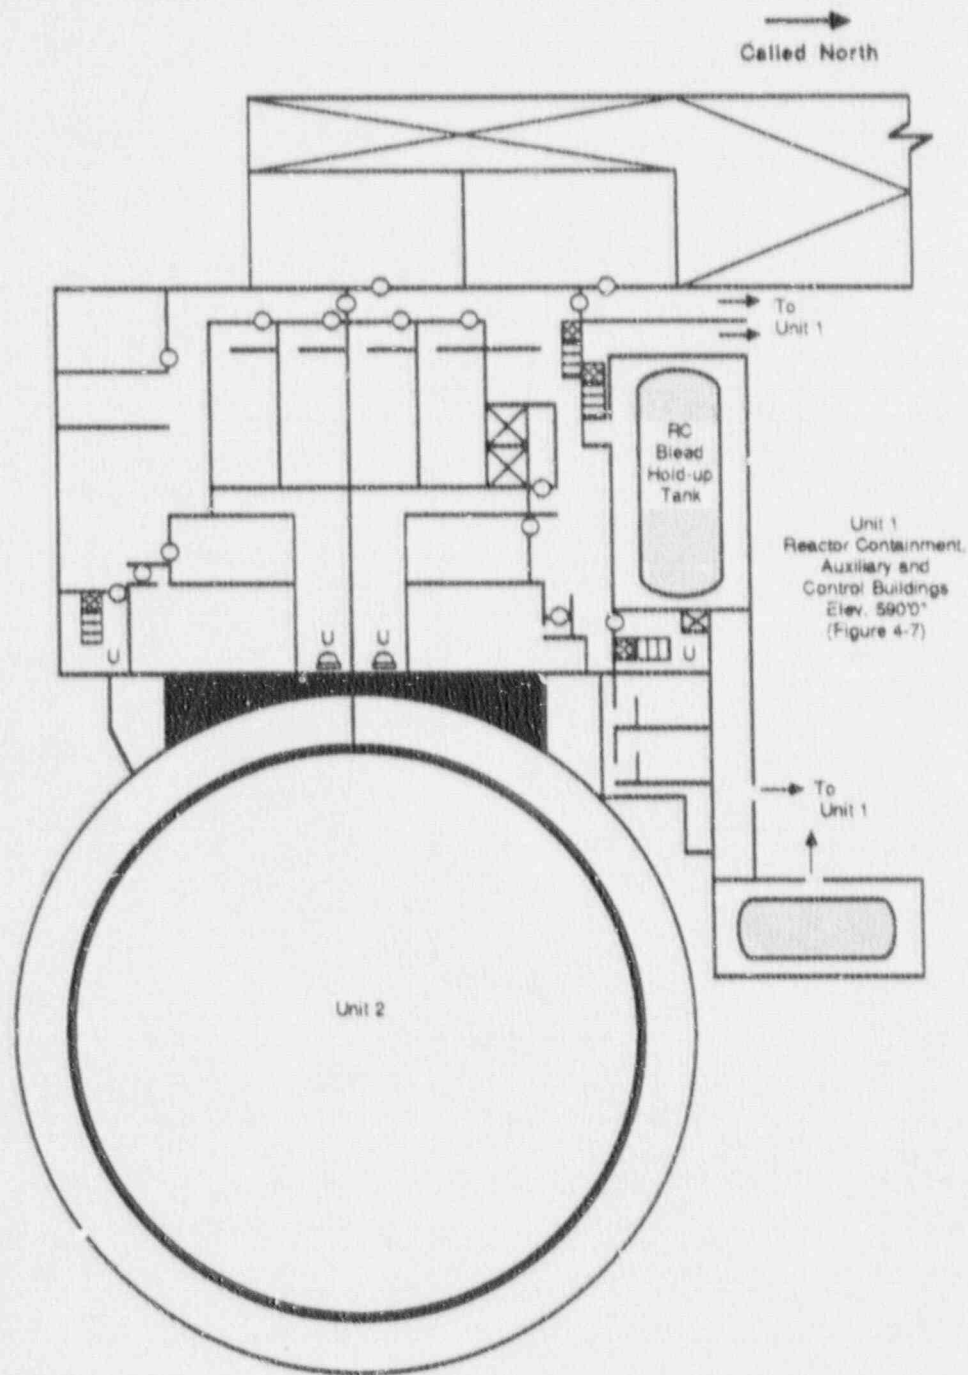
Bellefonte 2 Reactor Containment, Auxiliary and Control Buildings, Elevation 590'-0"
